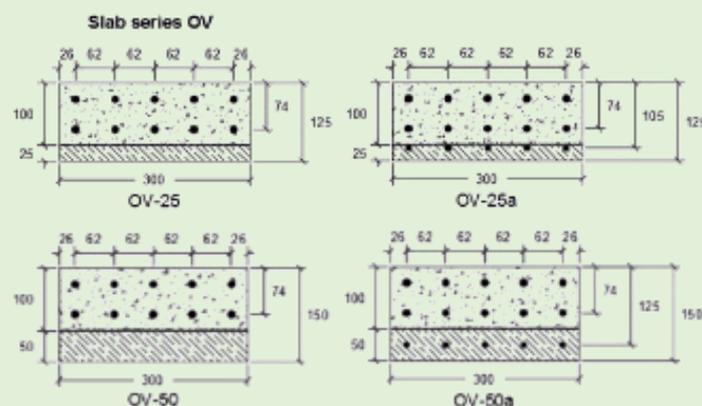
Details of strengthening configuration, sectional dimensions and reinforcement
